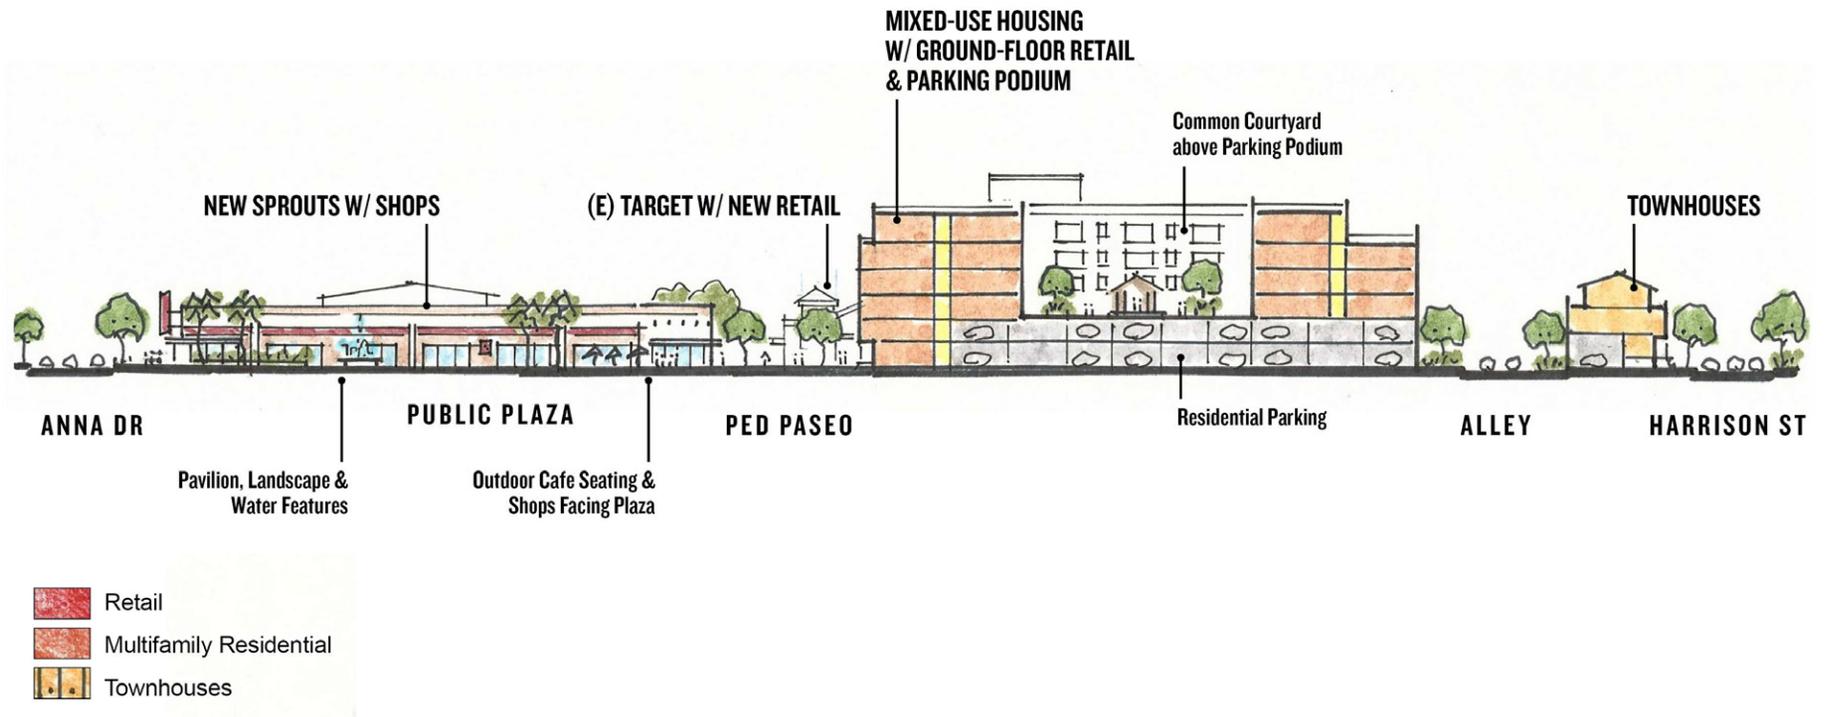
Regional Commercial Mixed Use – Santa Clara Town Center Conceptual Plan Cross Section
